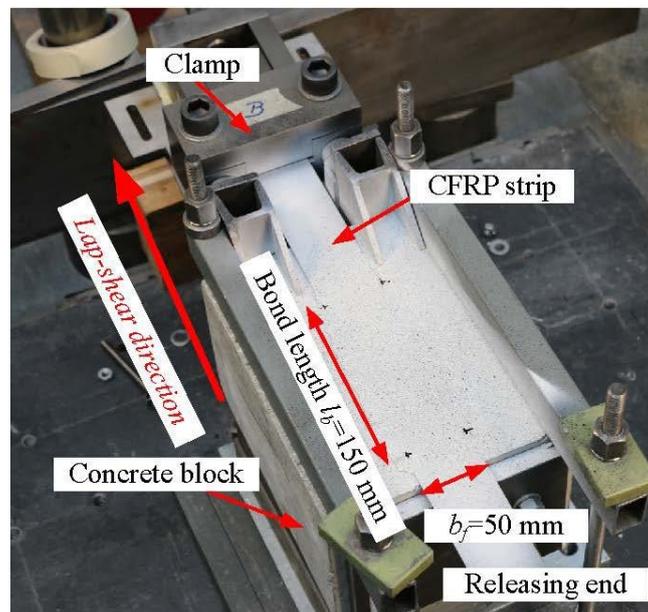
Concrete block with prestressed CFRP anchored with a single section gradient anchorage and painted with a speckle pattern for 3D-DIC measurements.
